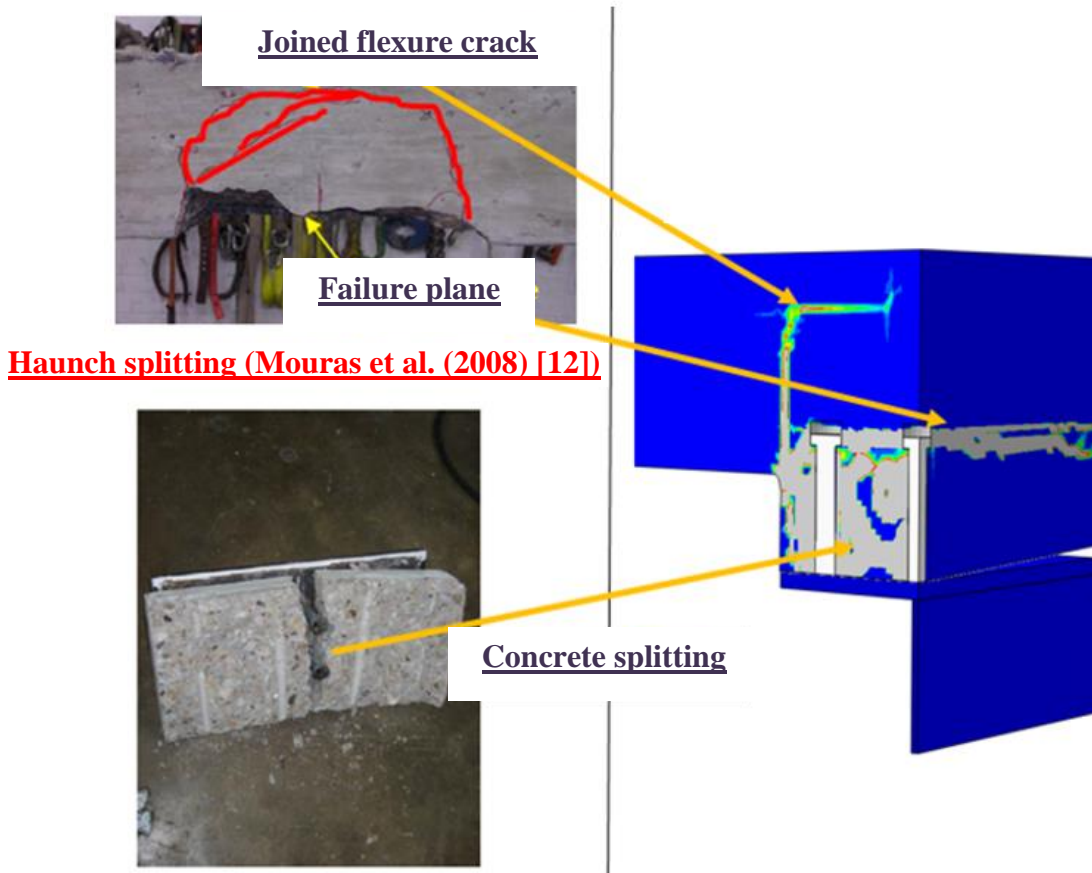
Concrete break-out failure mechanism under stud pulling and flexure (5-inch stud)
